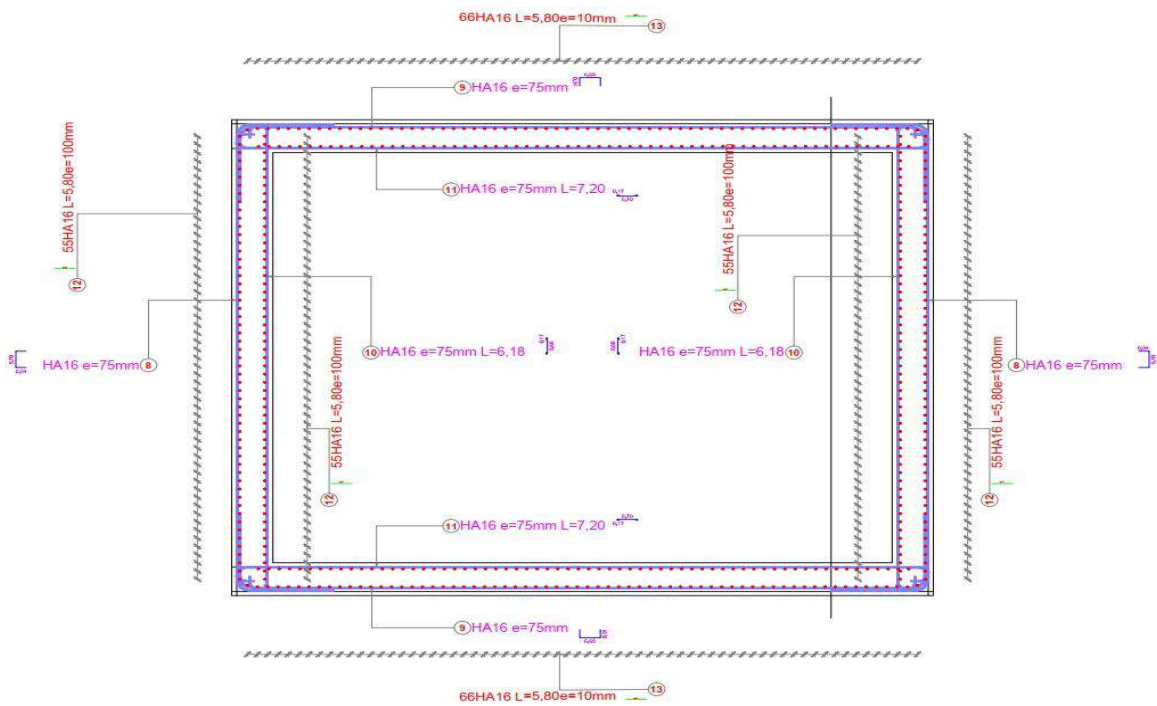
9. Reinforcement plan of CUT C-C(Walls)
